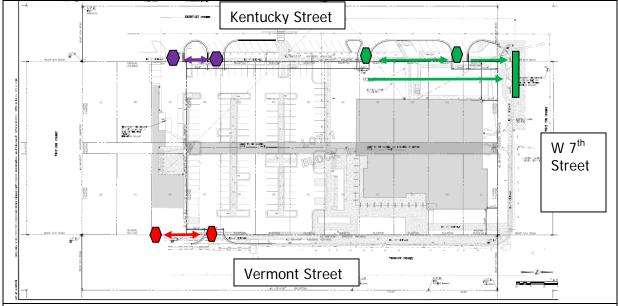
Waiver approved for spacing between driveways and spacing between northern 2 driveways on Kentucky Street and W 7th Street. Areas with inadequate spacing are shown in like colors.
